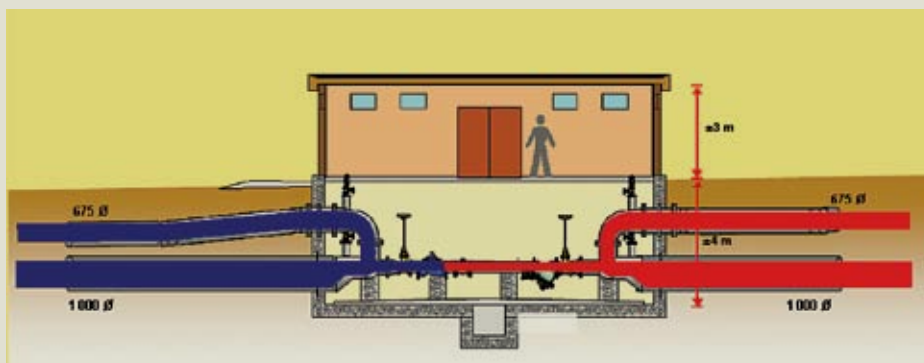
Elevation layout of the Sebokeng/Evaton installation
